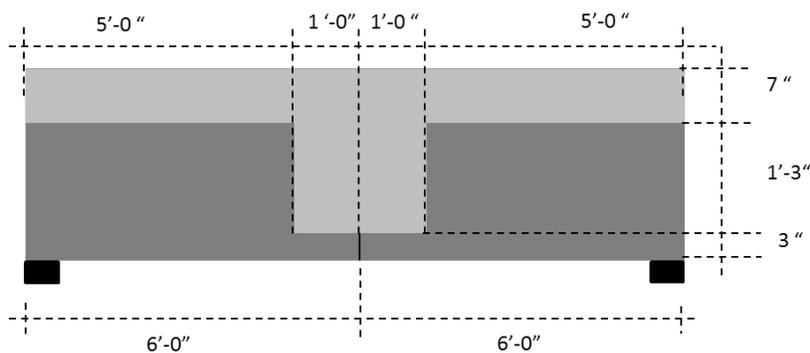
Test specimen with a straight web profile. Width of the specimen is 4 ft - 0 in.
